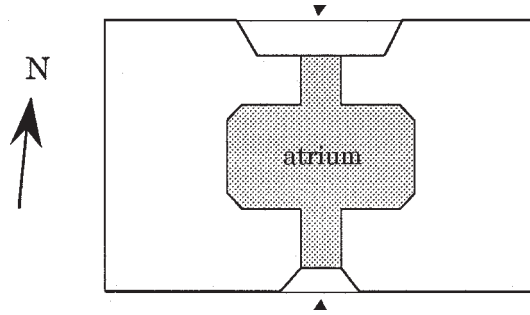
Plan of Siriushuset in Malmö (Wall & Blomsterberg, 1994).
